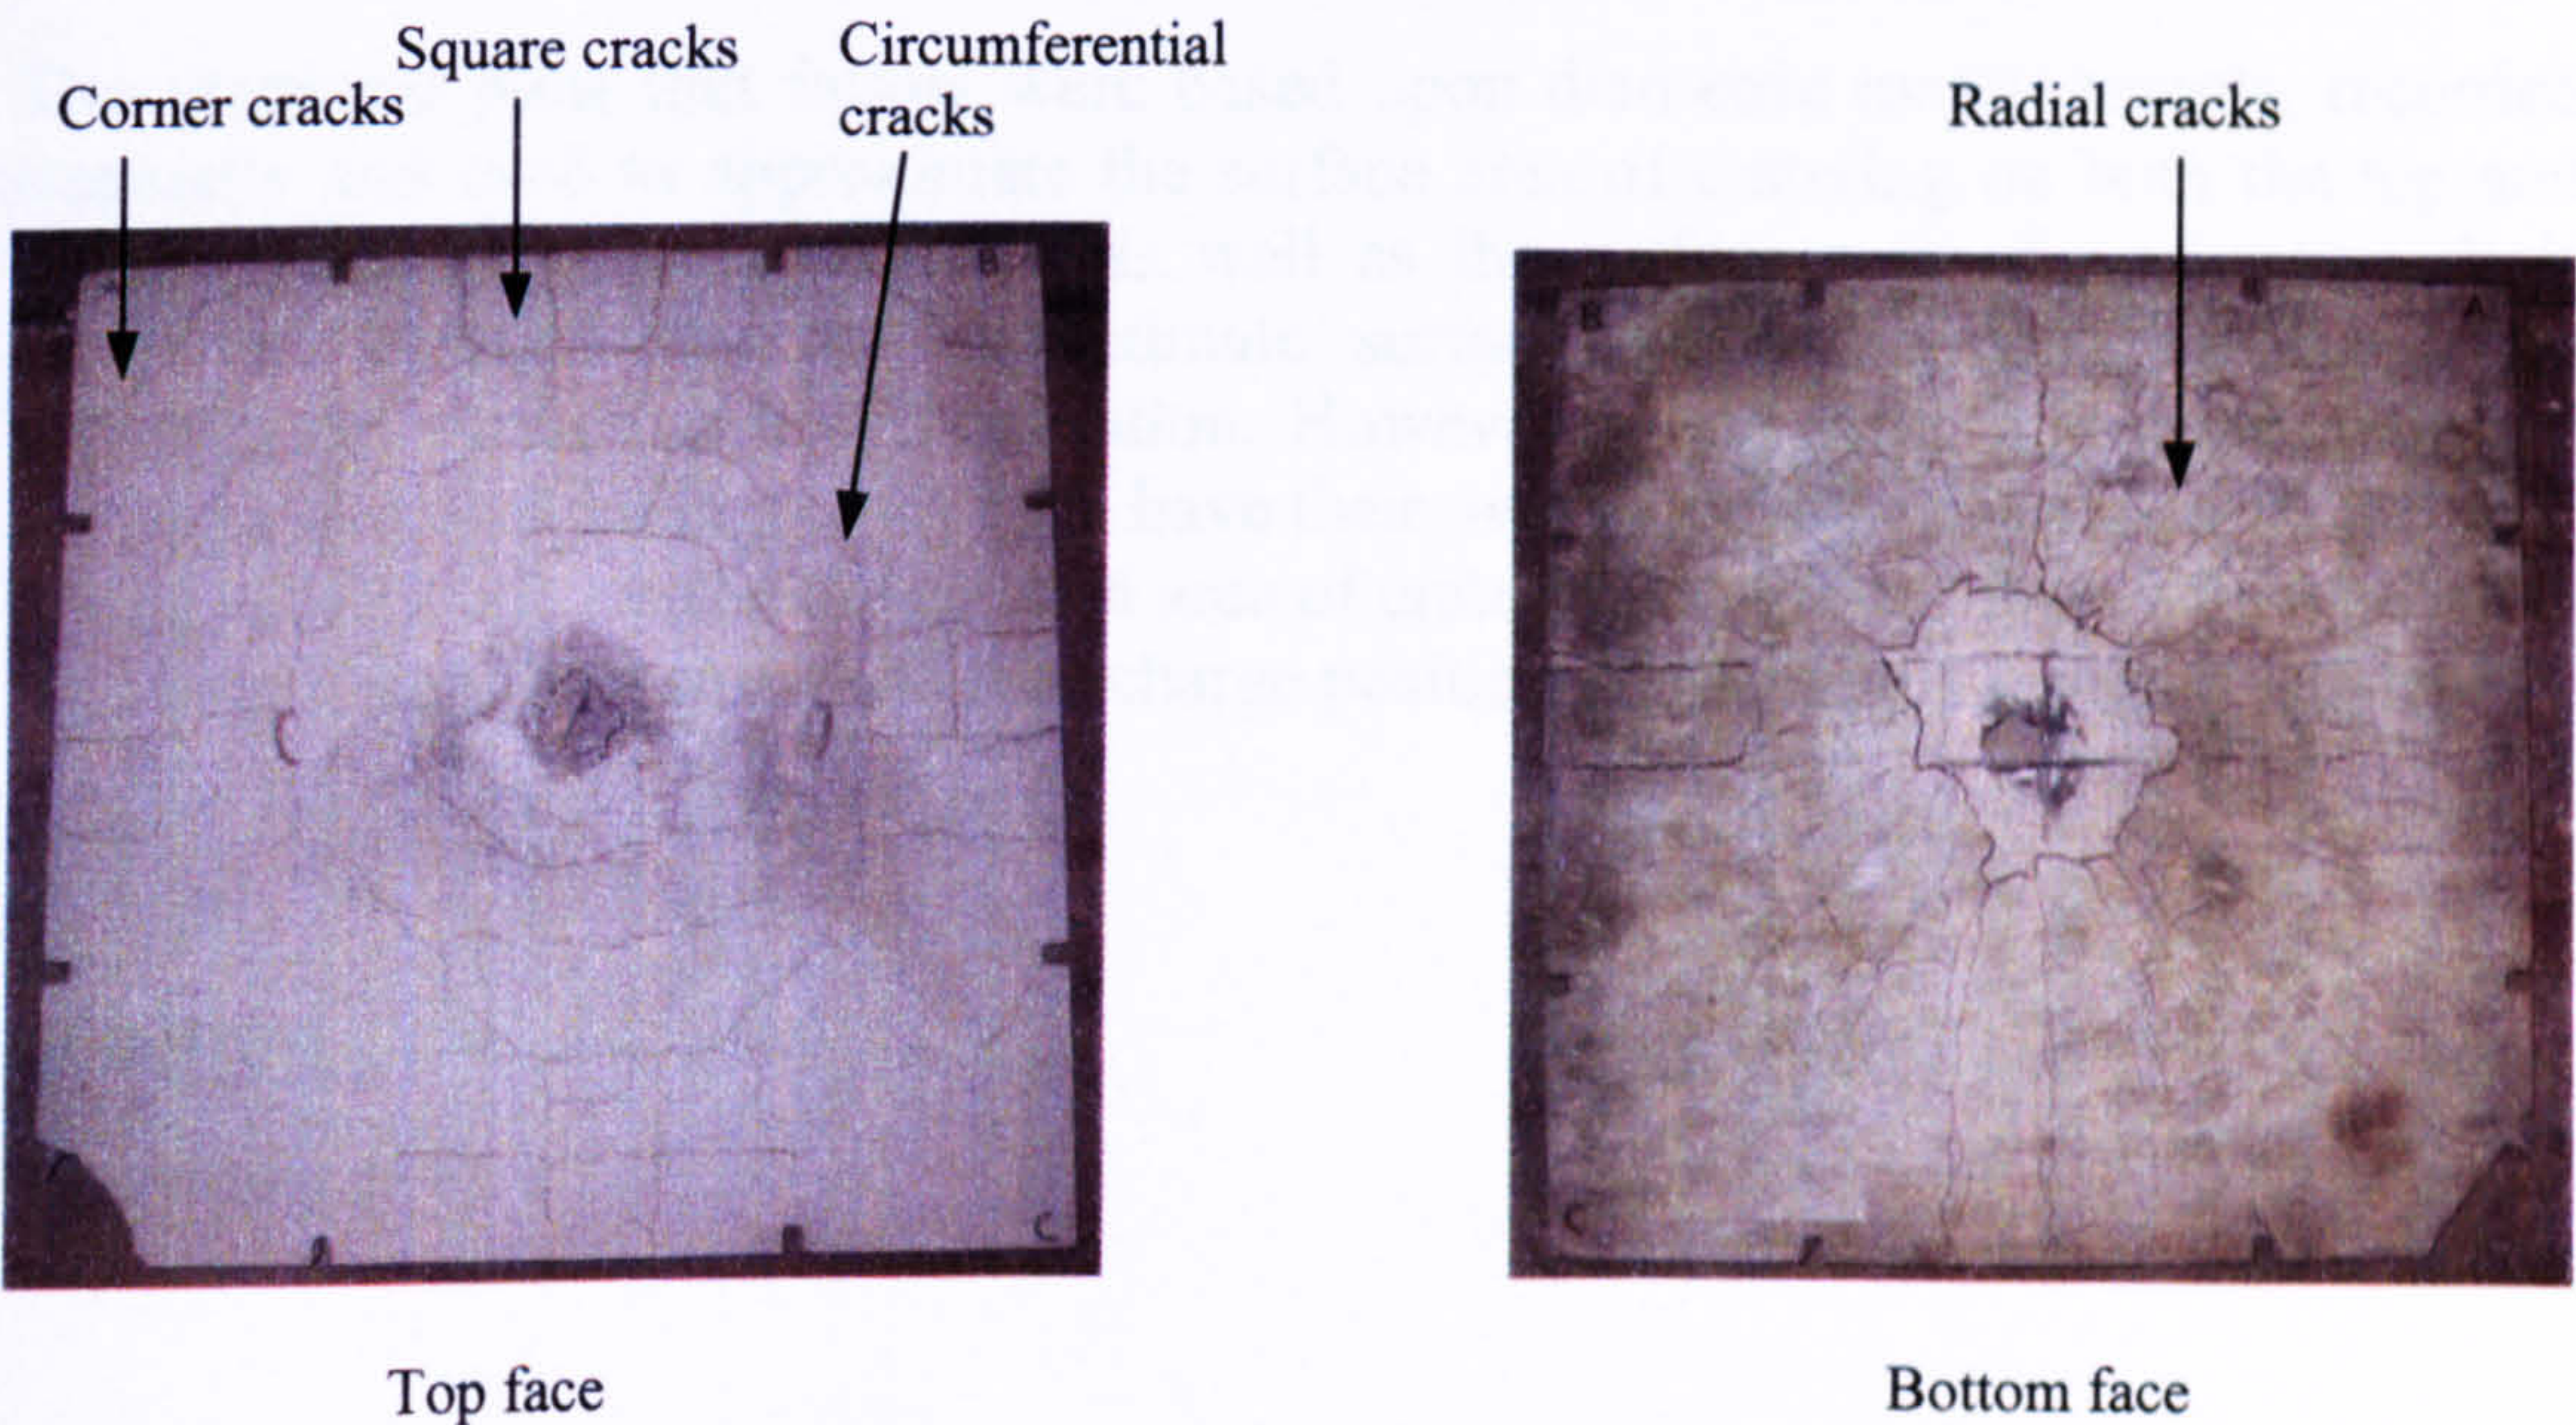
Top and bottom faces of secondary slab RCB73IT12
